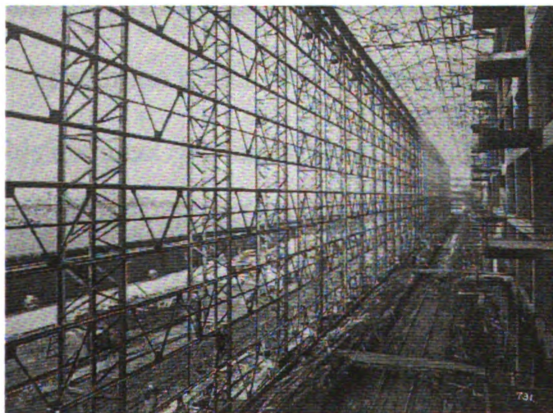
Construction photo of the steel structure of the 1914 extension factory. This steel frame would be covered in concrete and brick.
